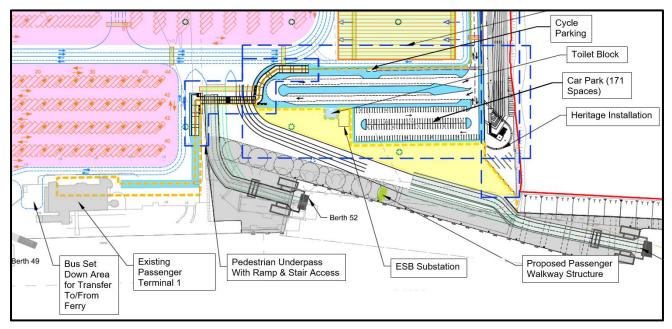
Section of Proposed Layout of UFT - Bus Turning, Car Parking and Pedestrian Walkway to Terminal 1 Building
